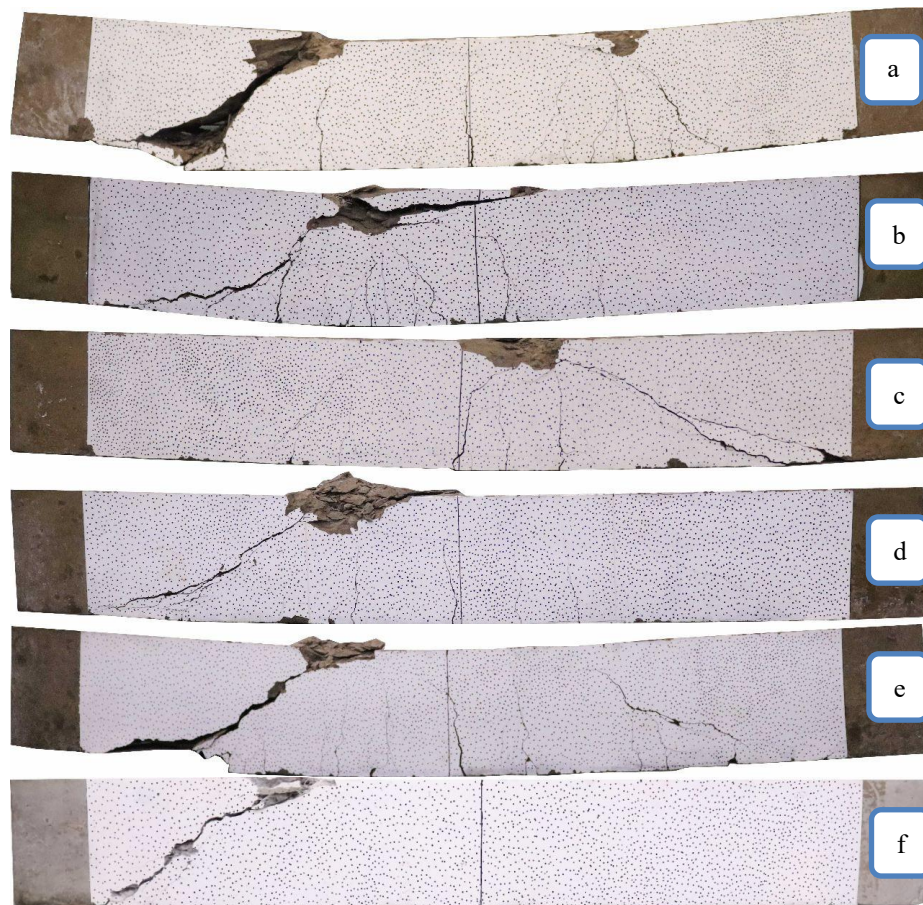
Crack pattern and mode failure of concrete beams; (a) G1A2, (b) G1B2, (c) G1B2.5, (d) G2B2, (e) G1C2, (f) P1B2
